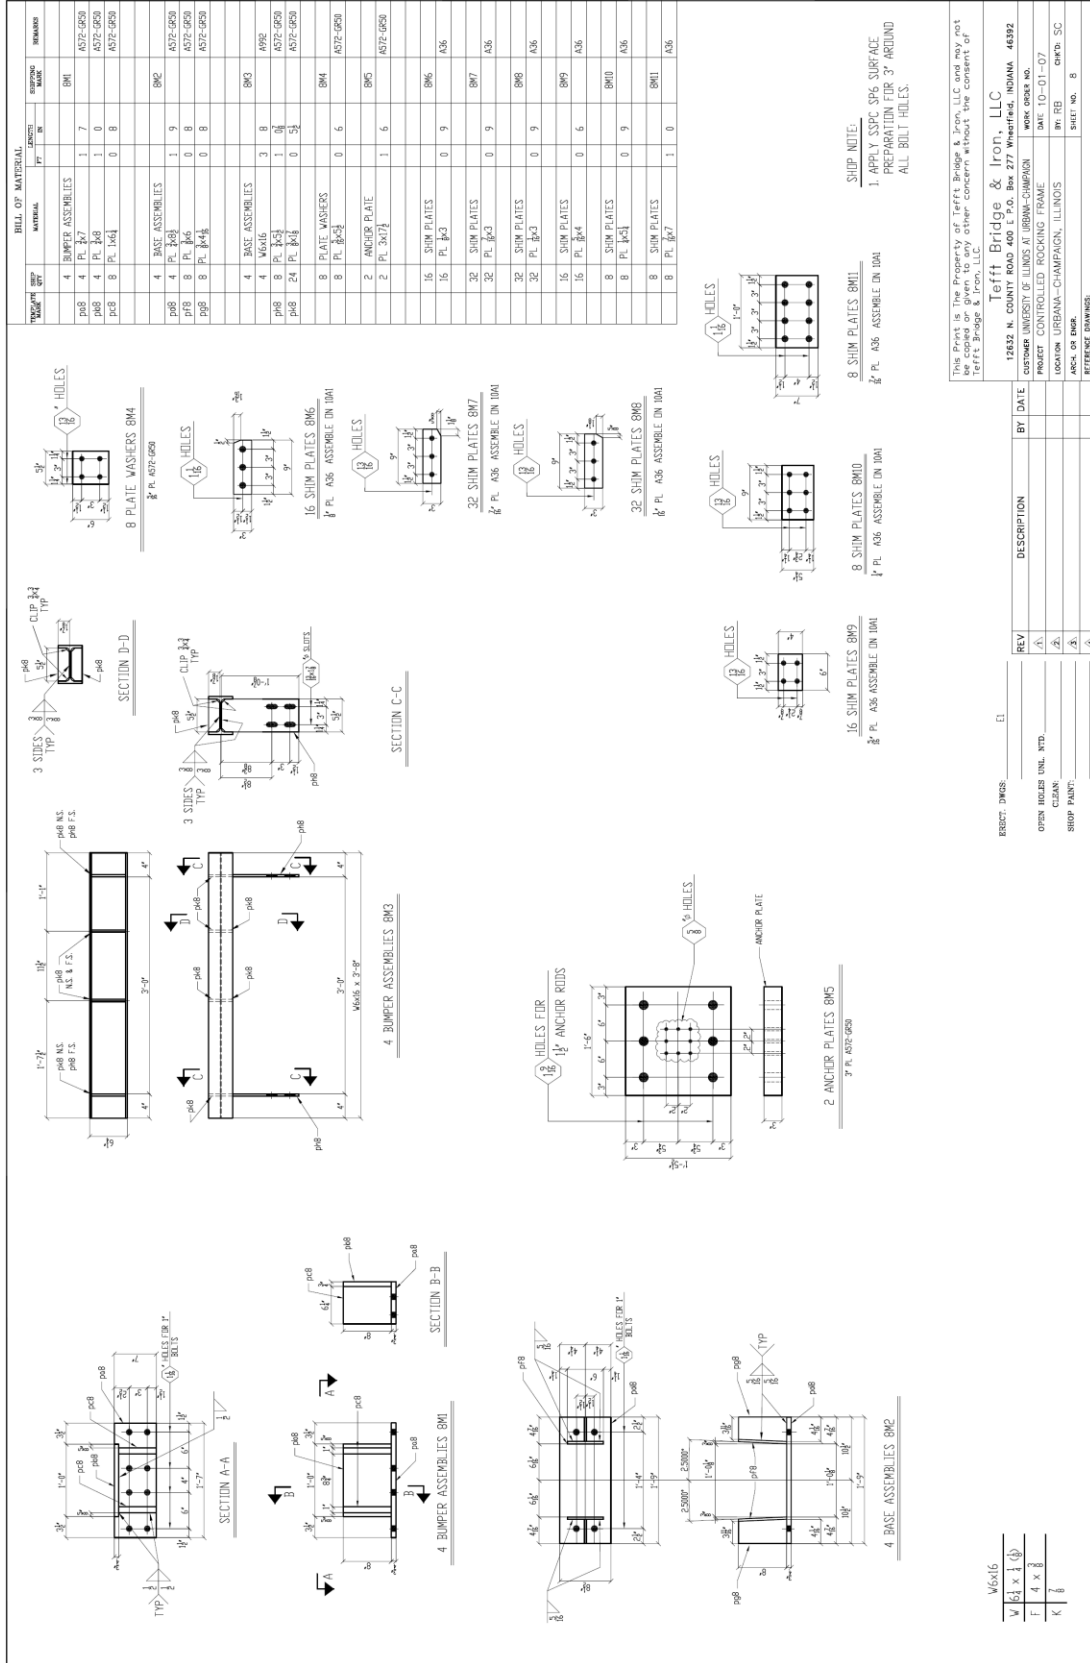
Shop Drawing for Fabrication – Miscellaneous Pieces
